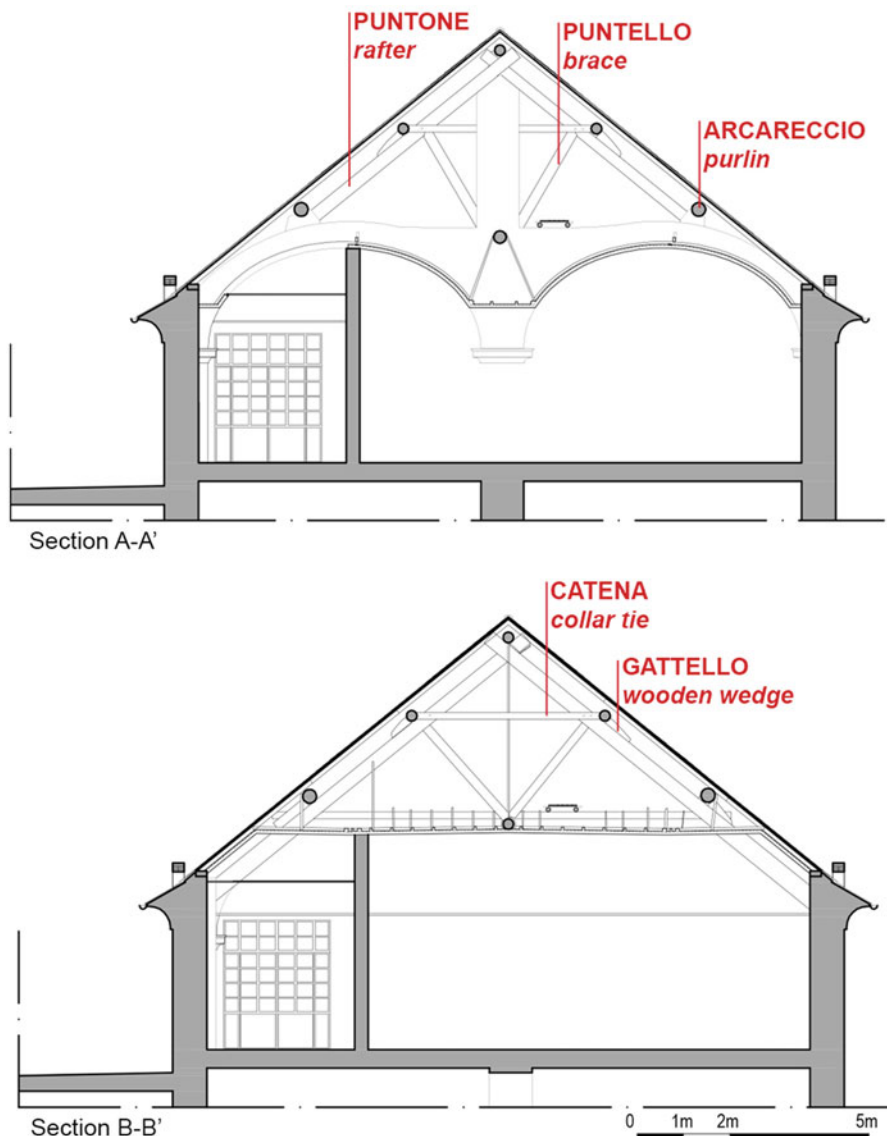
Sections A-A' and B-B'. Alternation of bearing structure on arches and pillars and roof trusses. The principal rafters have diameters which vary from 24 to 30 cm; the purlins from 23 to 34 cm; the braces from 22 to 26 cm; the collar ties are all almost with rectangular section with variable dimensions from 15×8 cm to 23×15 cm
